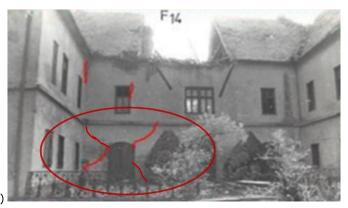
Diagonal shear cracking at the façade masonry walls of buildings in the epicenter of Banloc earthquake, 1991 [174]
